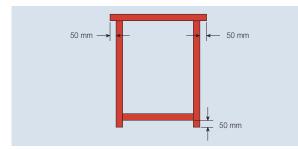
Kingspan* Kooltherm[®] Cavity Closer Sill, Jamb & Head Sections
